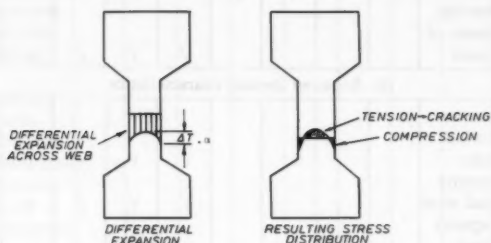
Differential Thermal Expansion across the Webs of Concrete Beams
